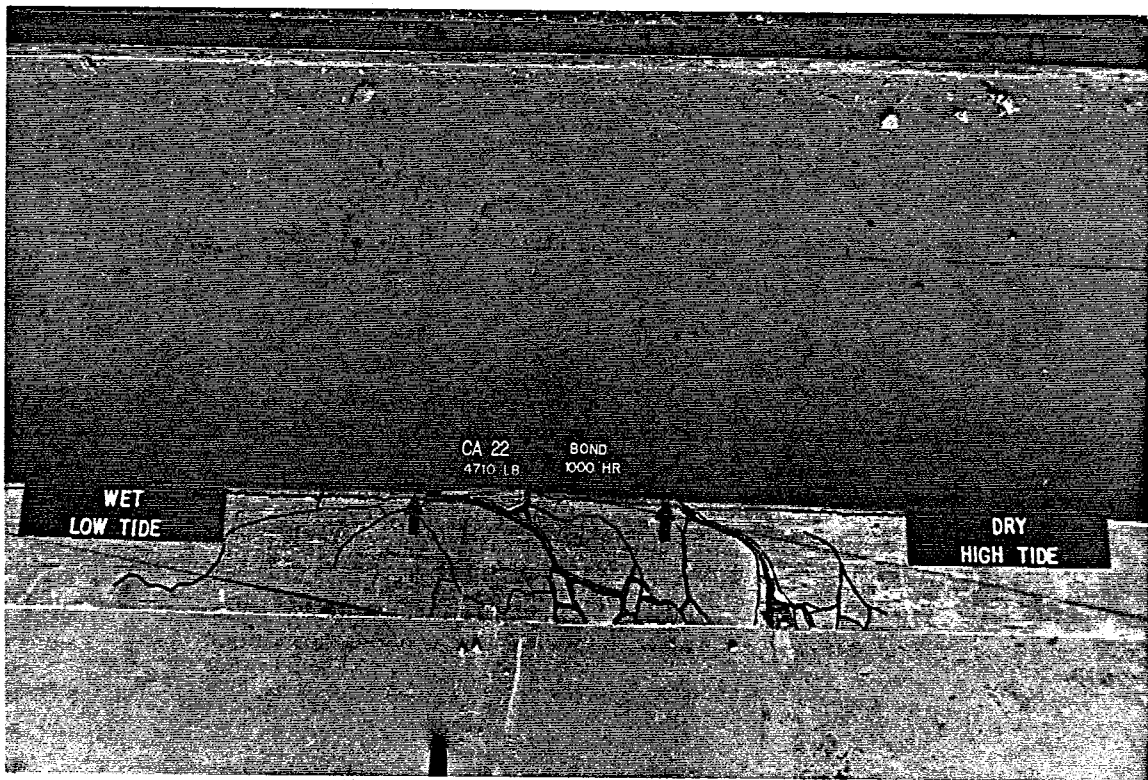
Crack Pattern for Beam CA 22 - Tested After 1,000 Hours
